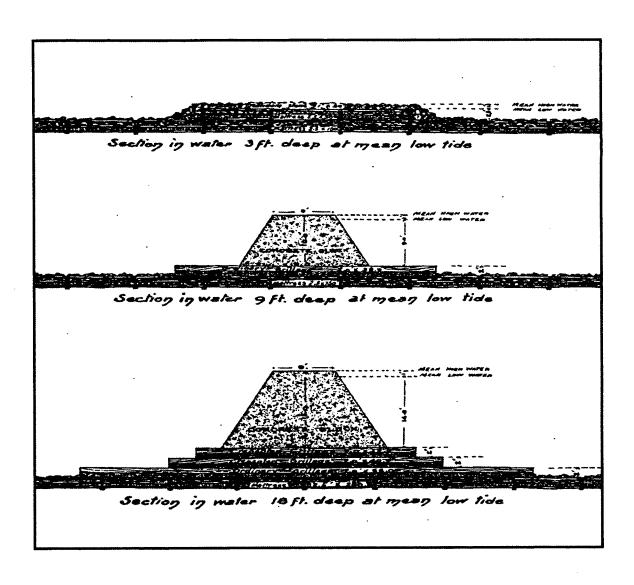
Sketch showing construction of jetties at Southwest Pass. From US Congress Document No. 329, 1900.
